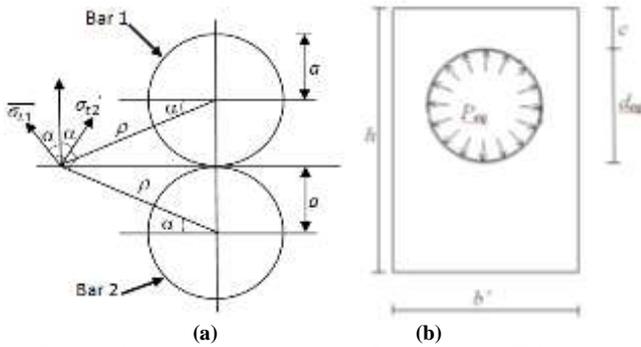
Prismatic concrete beam reinforced with two FRP bars: (a) Schema of the overlapped bars stresses. (b) The cross section replacing the overlapped bars section by one equivalent FRP bar section.
